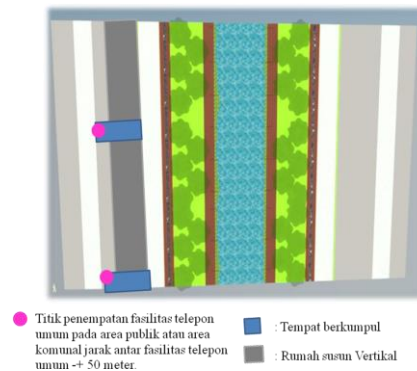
Point payphone Kp.Jembatan placement Concrete Way Blau [11]
